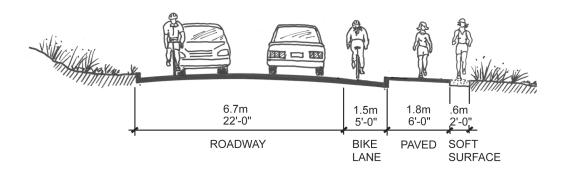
Proposed Development of Juan Bautista de Anza Trail at Battery Caulfield Road
